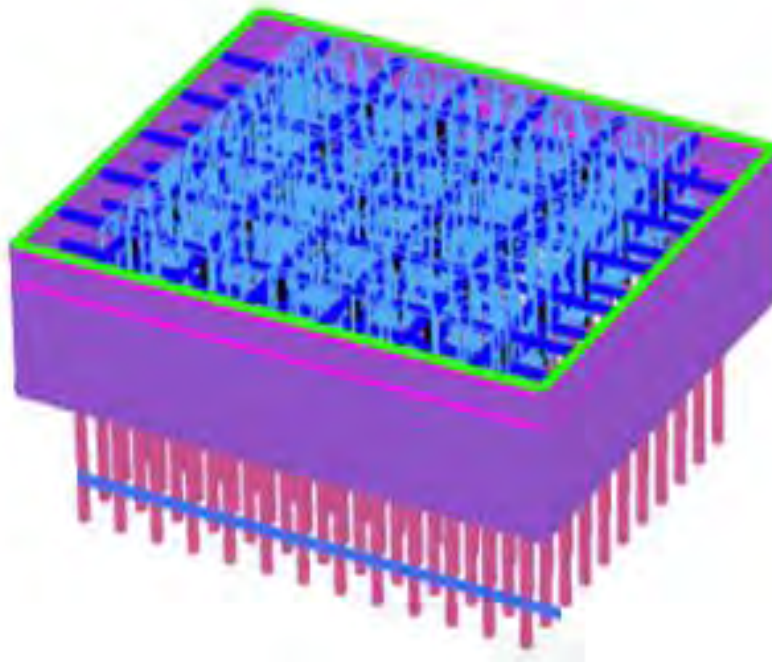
Connectivity plot of finite element model containing contiguous pile wall retaining system
